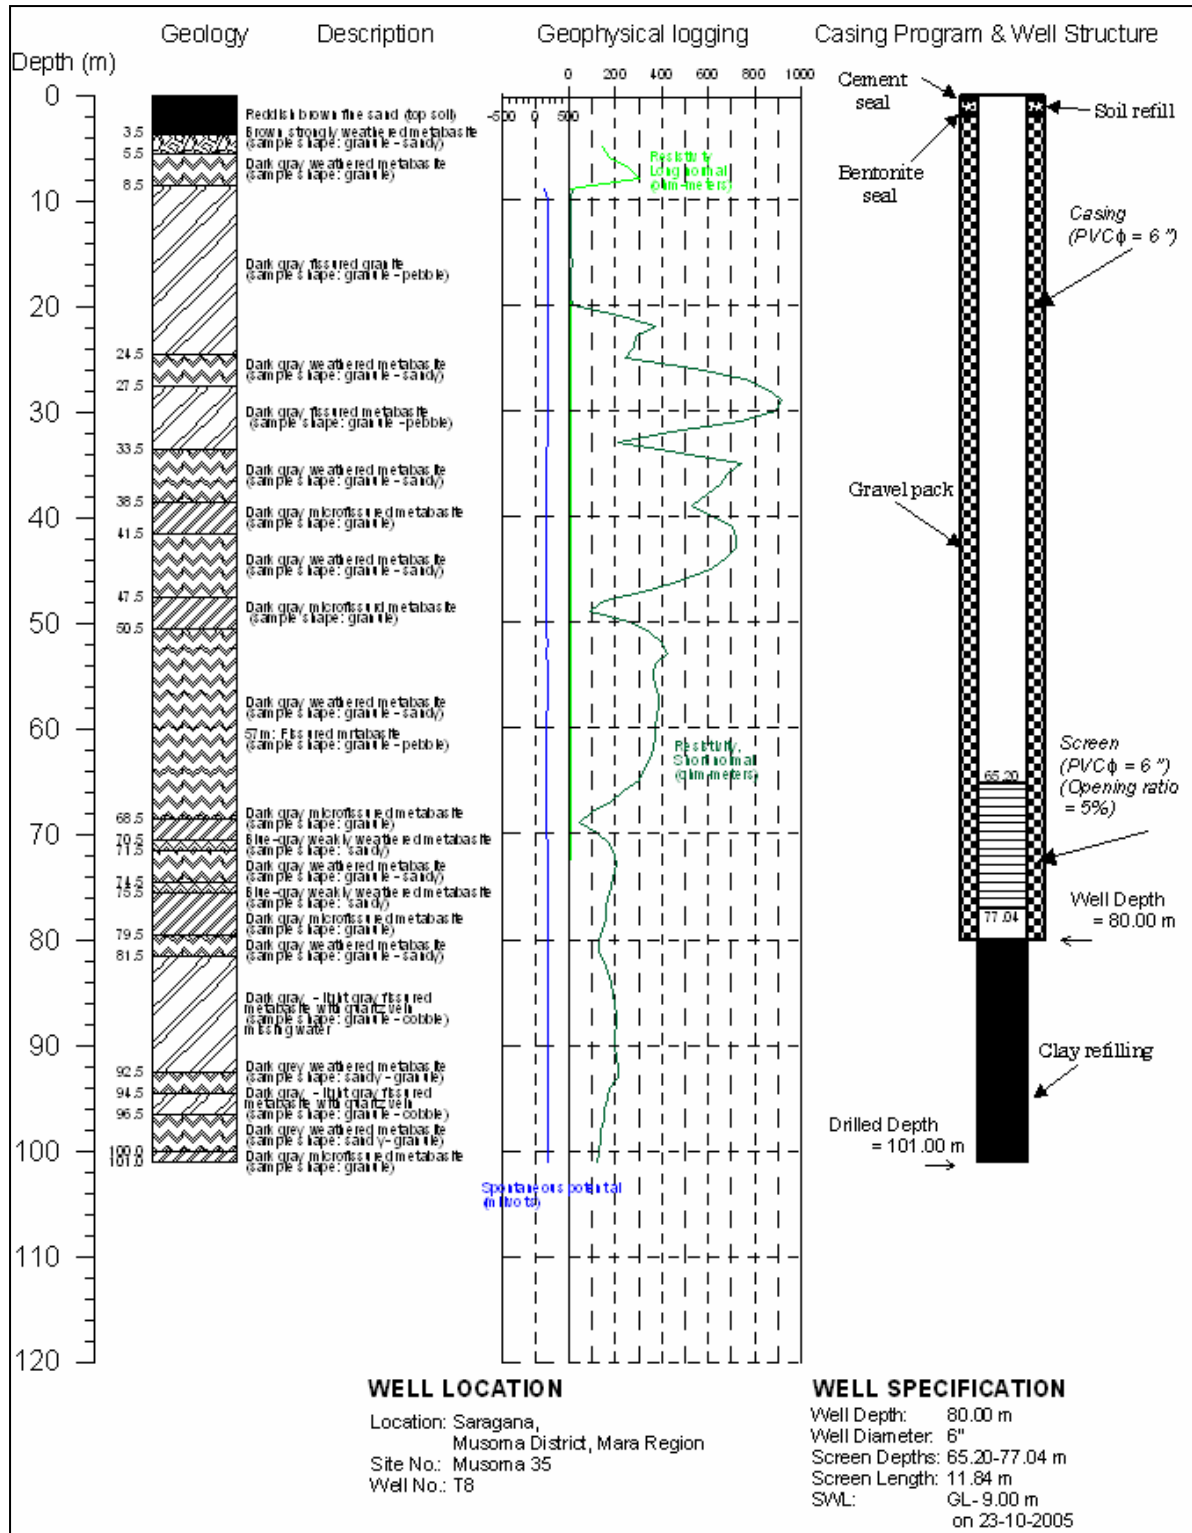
Columnar and Section and Well Structure (Saragana)
